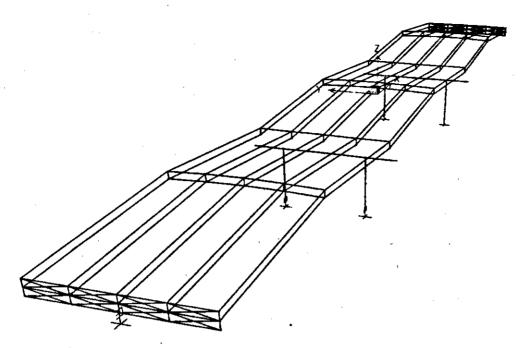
Mode 1, Period 0.2686 Seconds (New Wahite Ditch Bridge)
